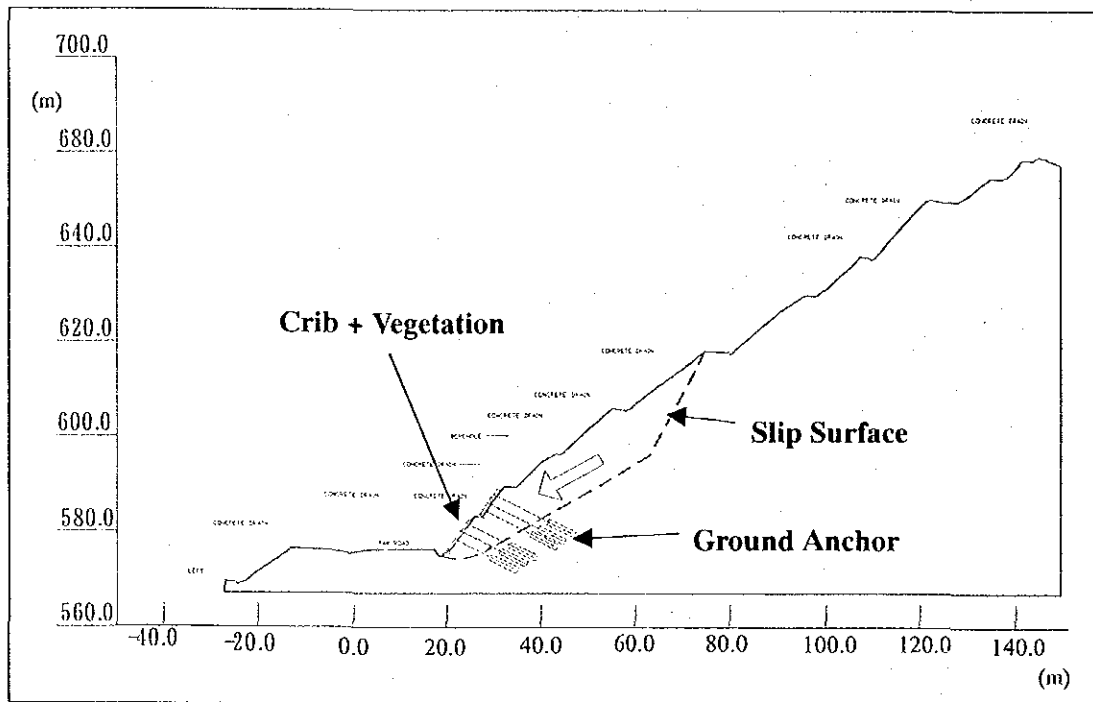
Cross section of ground anchor works in CH 27.00 km
